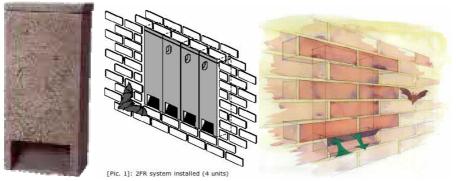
Bat tubes incorporated into the wall of a building to provide roosting space.
